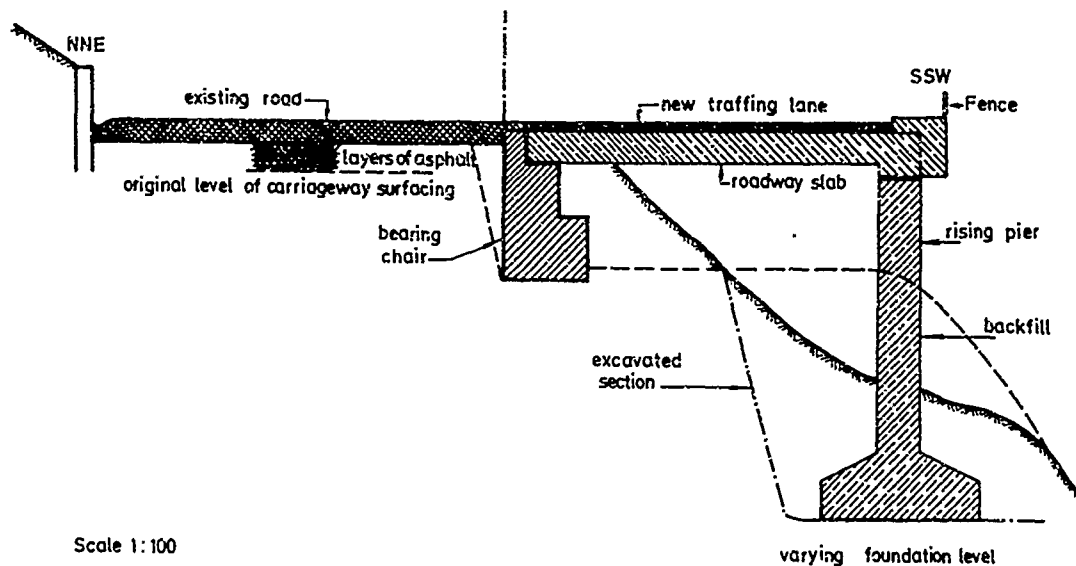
Cross-section of the Semi-bridge and Details of Excavation and Backfilling
